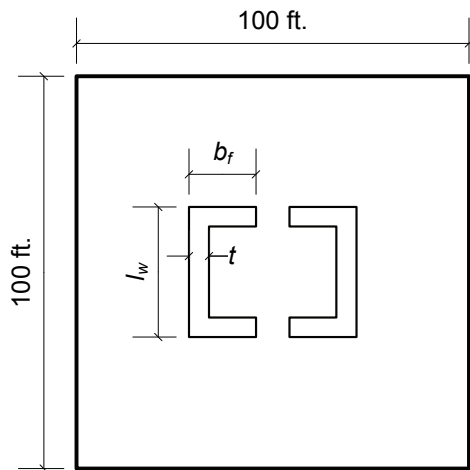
Plan view of special reinforced concrete core-wall archetype.
